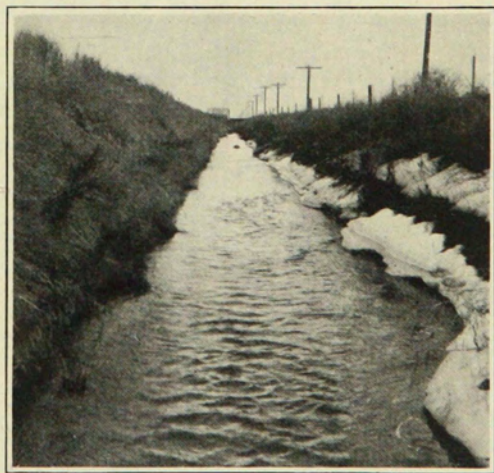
View looking up Prewitt Drain Ditch from a point near the outlet end of the drain at river.
